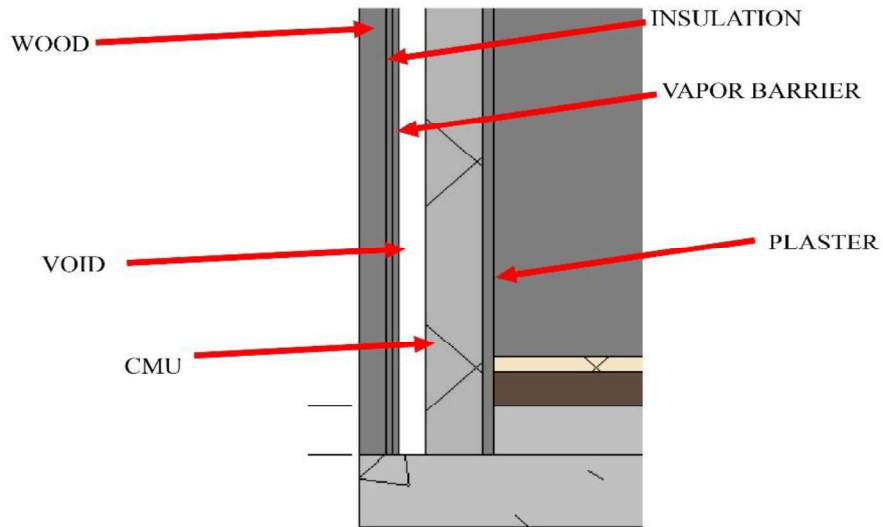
Wall section showing construction materials. Source: Revit Autodesk 2020 by Author
